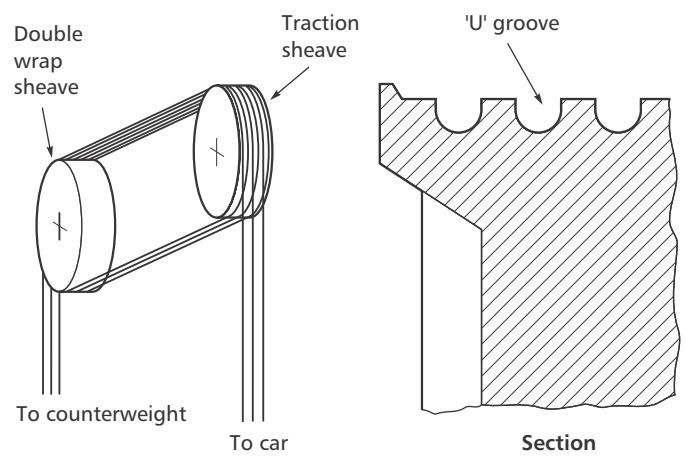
Double wrap arrangement with 'U' groove and detail of traction sheave
